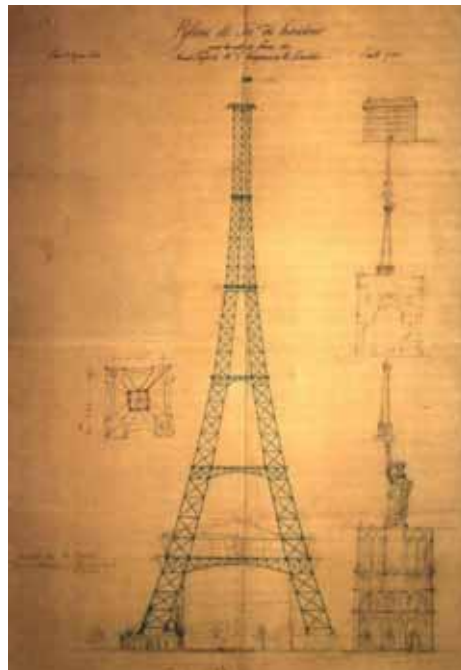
First drawing of the Eiffel Tower by Maurice Koechlin.
